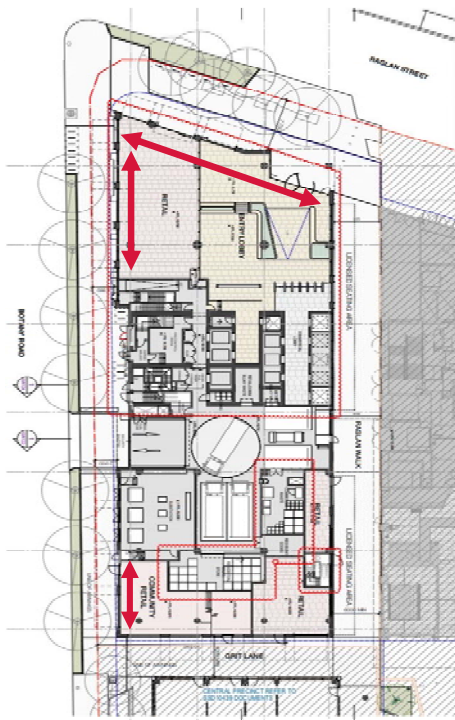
| Proposed ground floor showing extent of active street frontage (Source: RtS)
